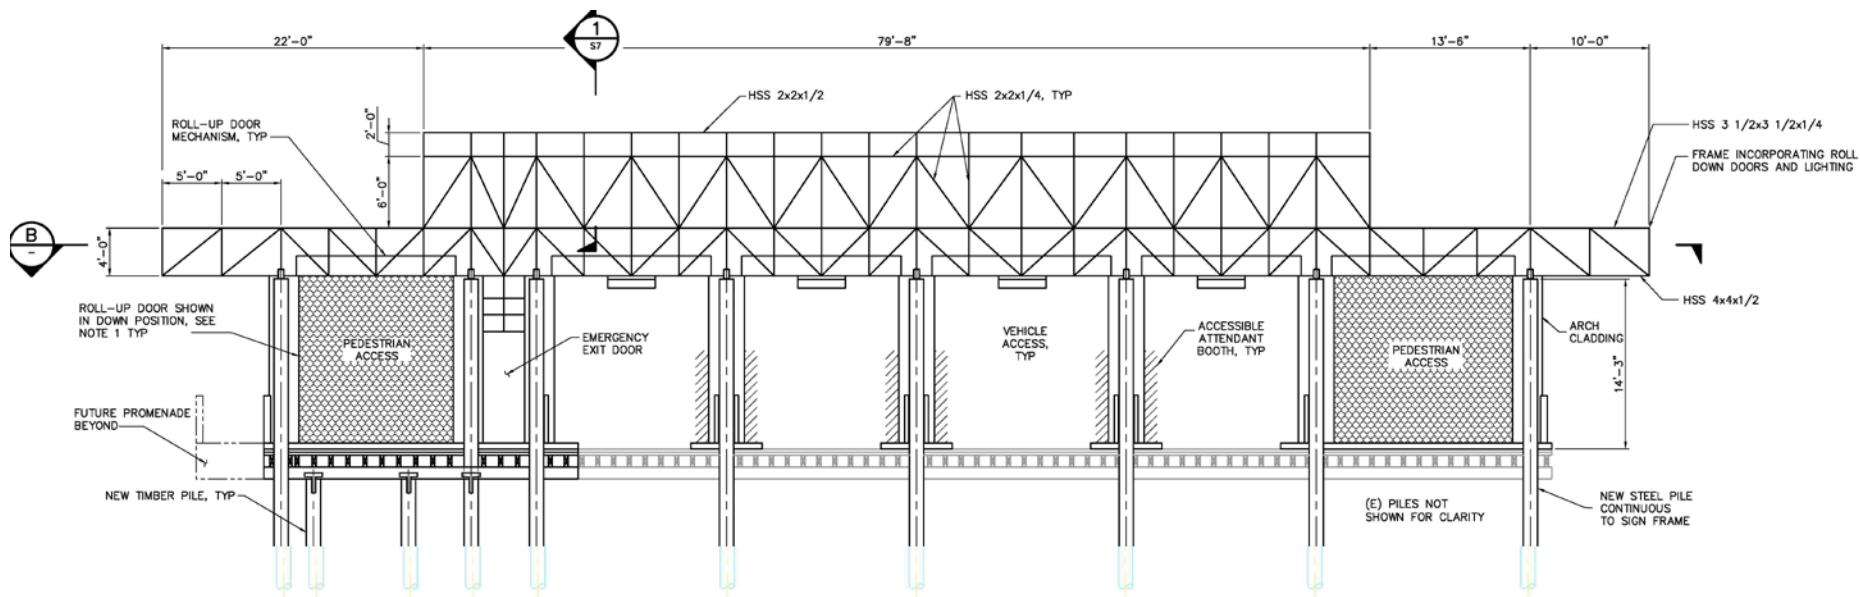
C: Entry Gate/Sign Structure Elevation
